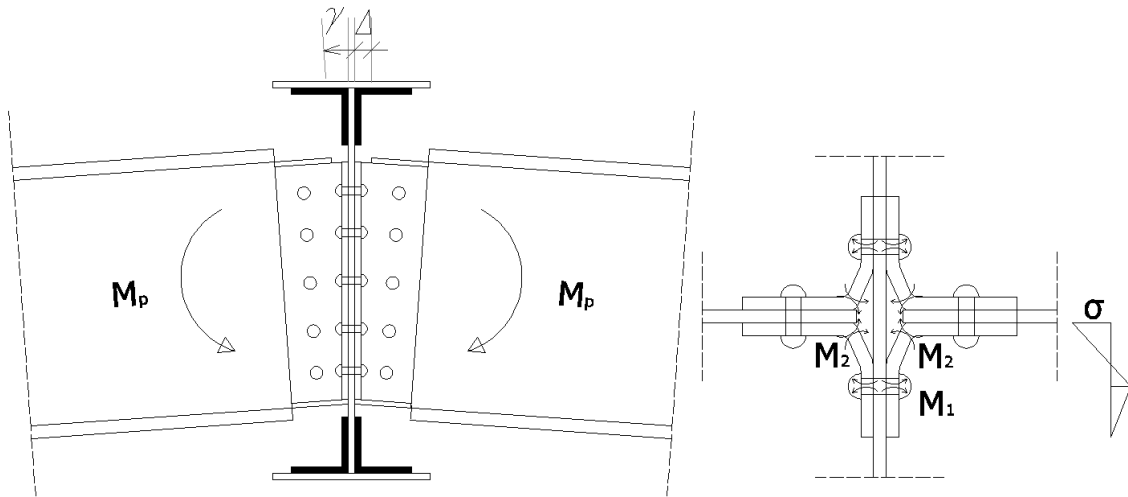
Distortion of outstanding legs of connection angles due to applied load, bridge #1
